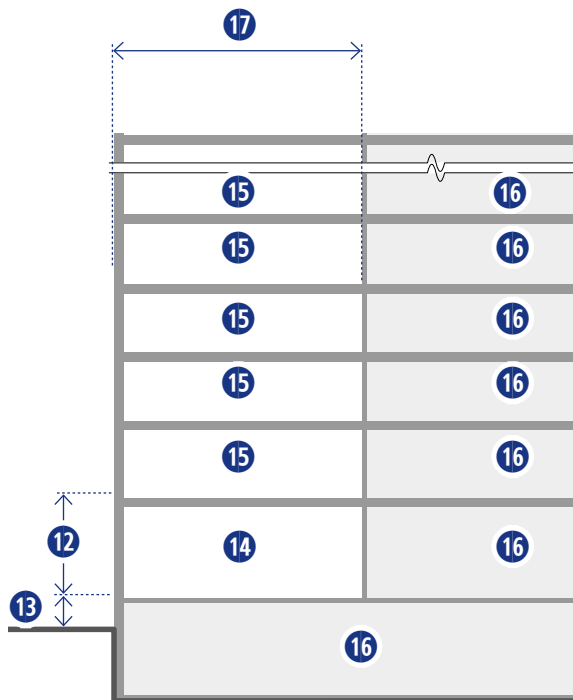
General Building: Floor-to-Floor Height & Use Requirements
